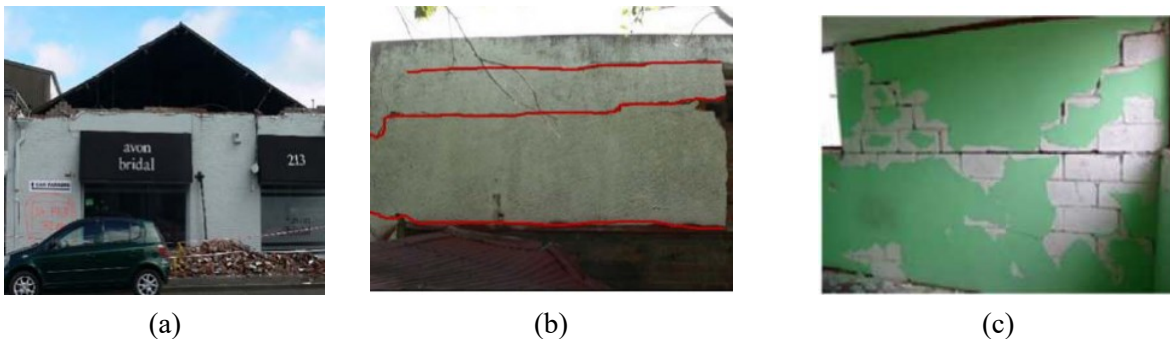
Failure modes of masonry walls under OOP loading: (a) overturning failure (Giaretton et al. 2016), (b) one-way bending failure (Giaretton et al. 2016), and (c) two-way bending failure (Astroza et al. 2012)
